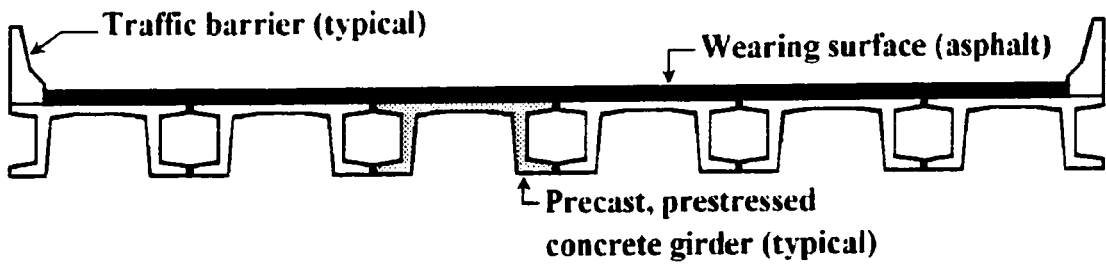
Typical Nebraska All-precaster Bridge of Pie (π) Sections
